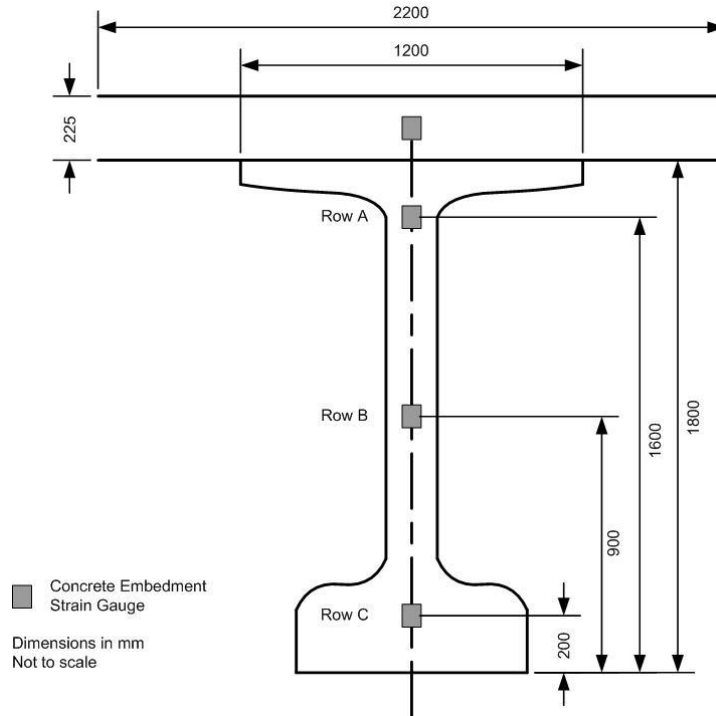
Cross-sectional view of the composite section showing the concrete strain gauge installation locations.
